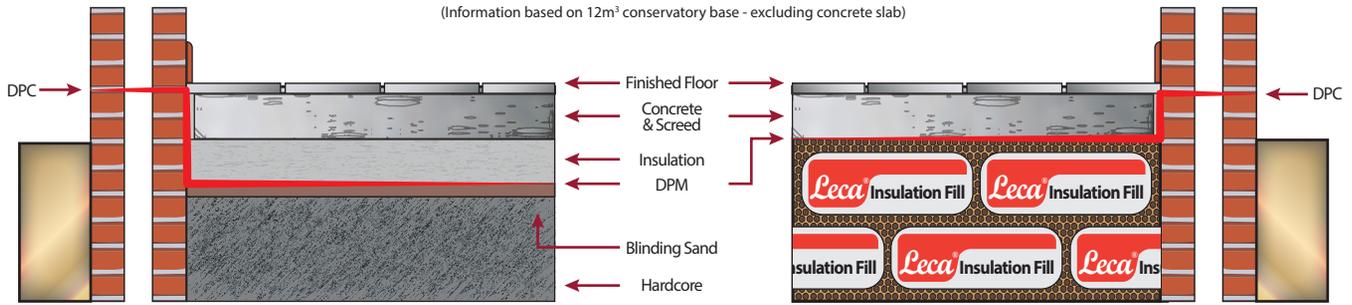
Figures based on 50mm self levelling floor compound or 100mm standard concrete covering slab
